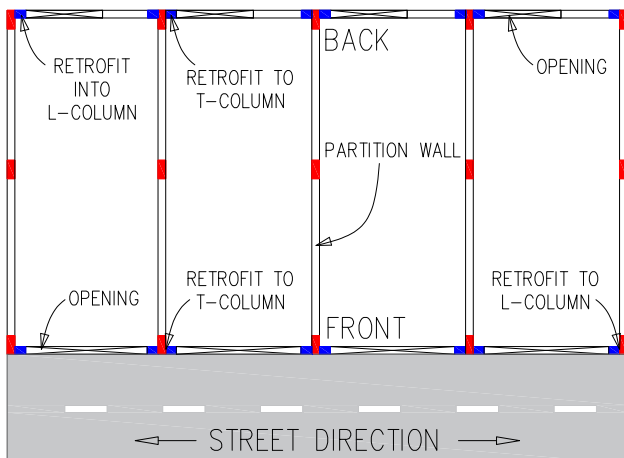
Plan view of the first story with proposed retrofitted columns.
